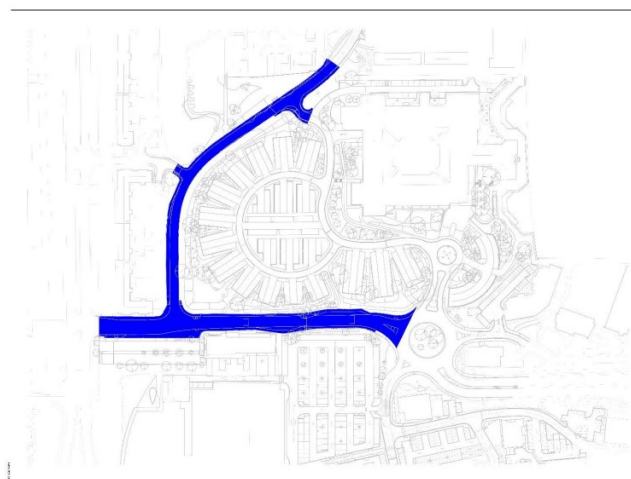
Areas of Hemingway Road & Schooner Way to be stopped up
